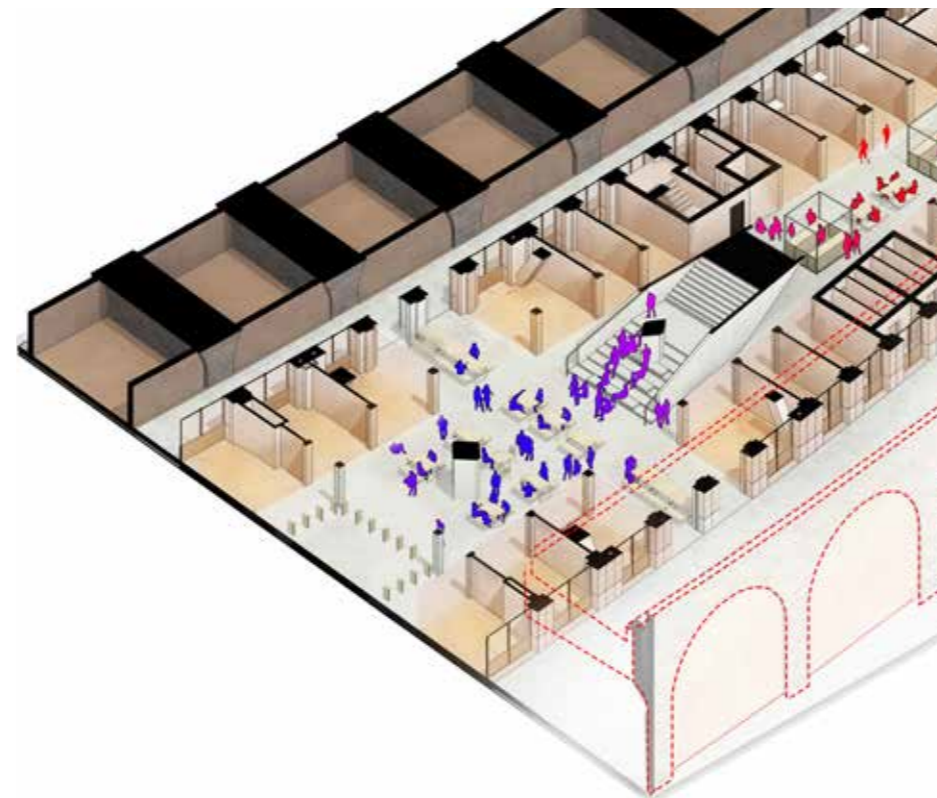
Publicly Accessible Open Space illustrative ground floor axonometric diagram
